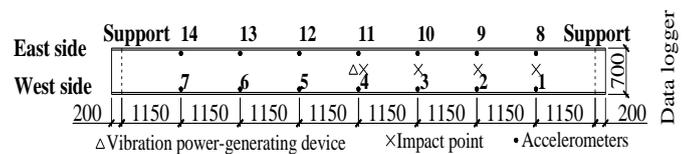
(a)-(b): Diagram of PC girders (unit: mm)
